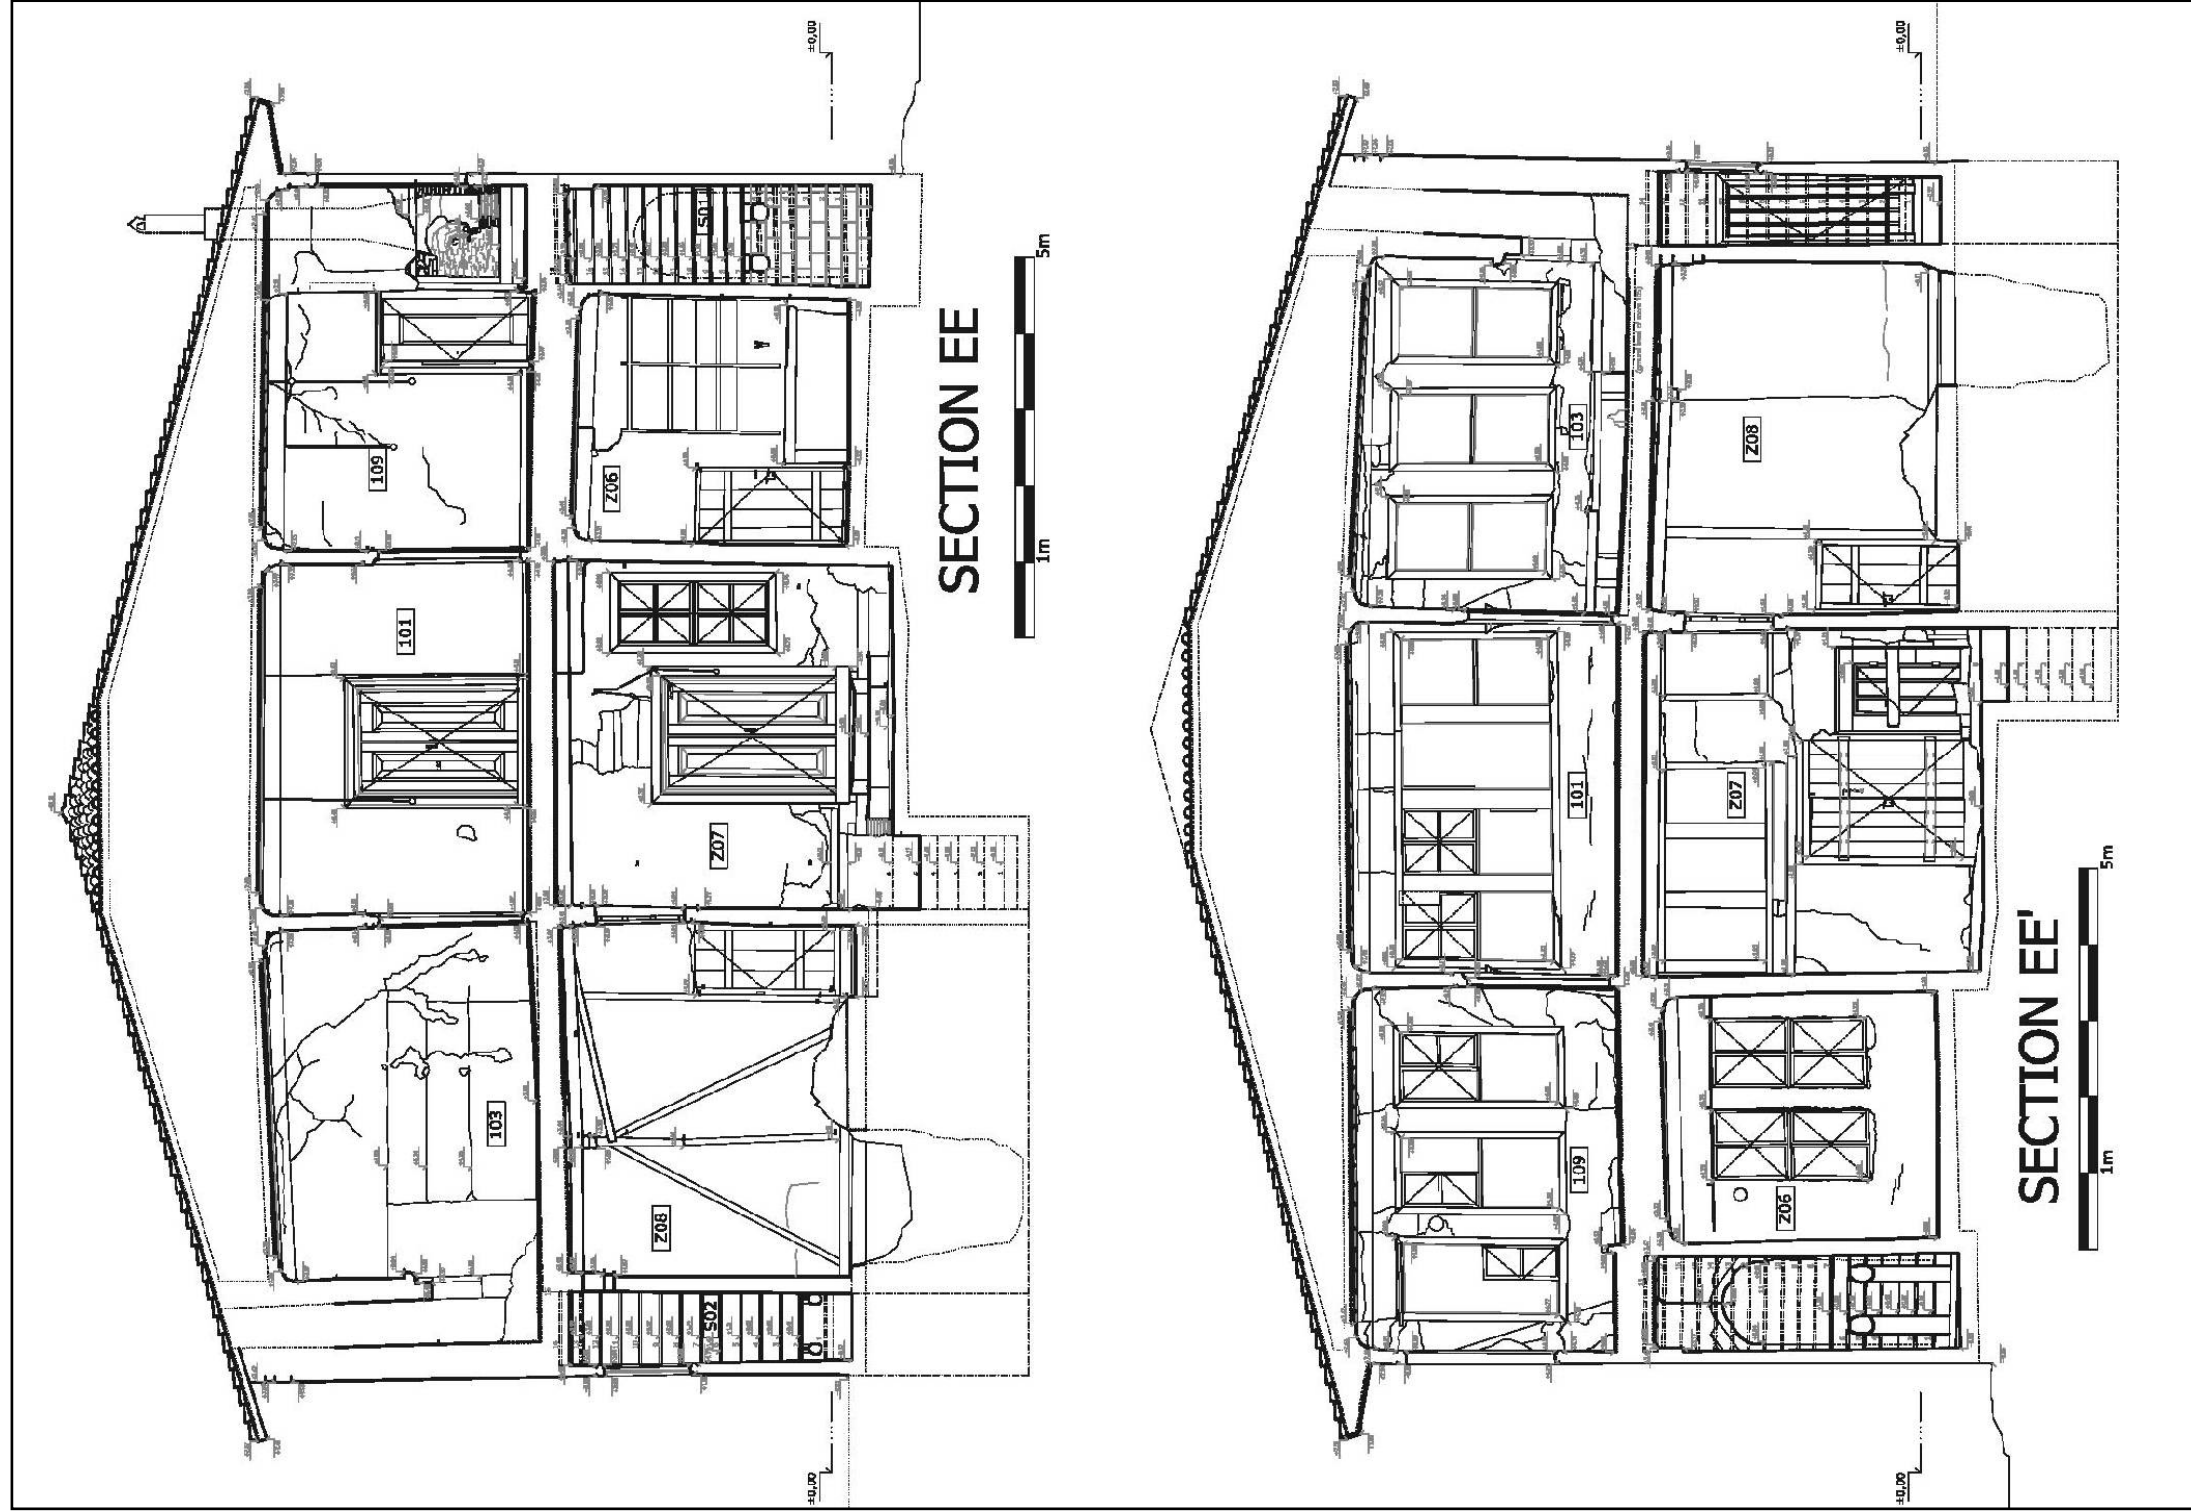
Sections –EE, EE': 1/100 (presented in 1/50 at Jury)
